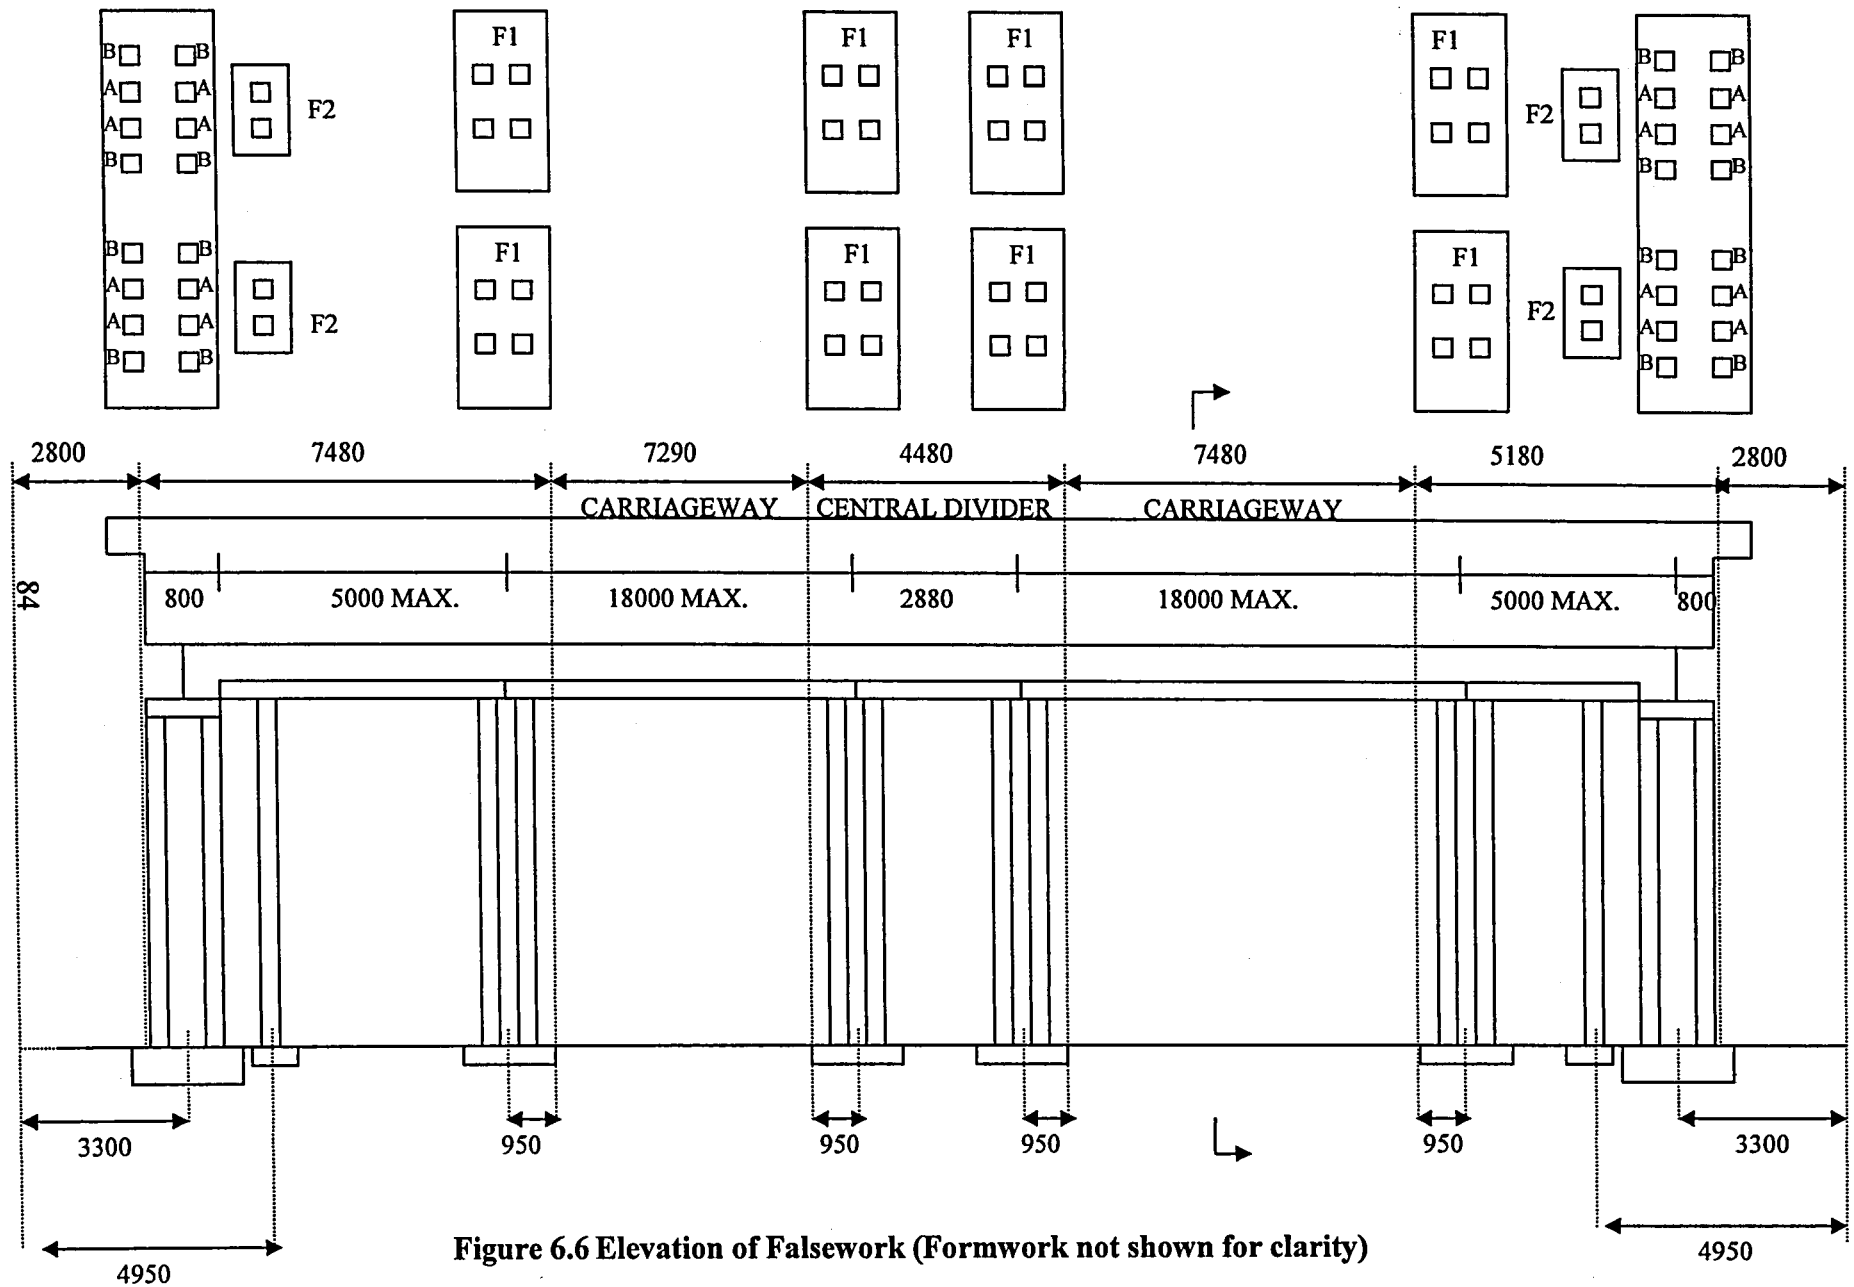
Elevation of Falsework (Formwork not shown for clarity)
